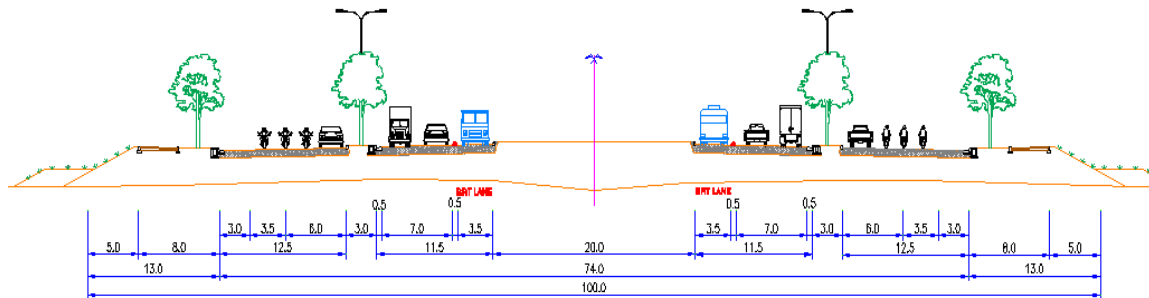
9 Layout and BRT lane of segment 4: Thu Thiem Tunnel – Cat Lai Junction
